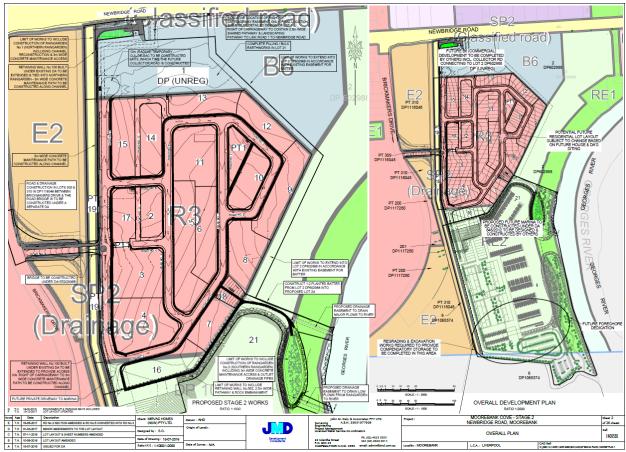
Zoning Map overlaid over works proposed in Stage 2 of development at 146 Newbridge Road, Moorebank
